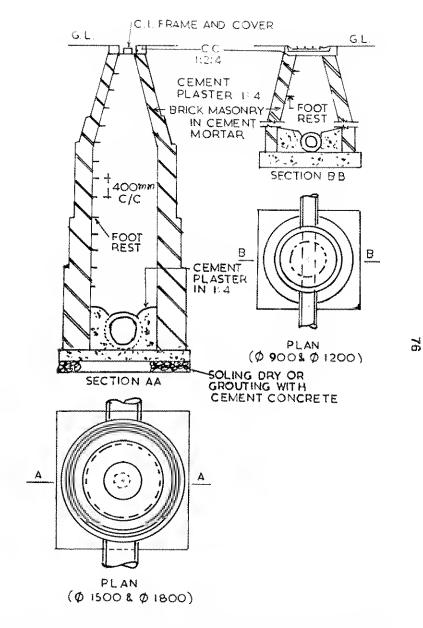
TYPICAL ILLUSTRATION OF CIRCULAR MANHOLES
